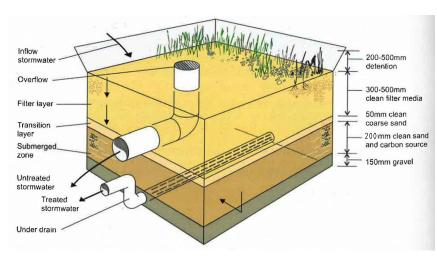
TYPICAL CROSS SECTION THROUGH BIORETENTION BASIN WITH SATURATED ZONE
